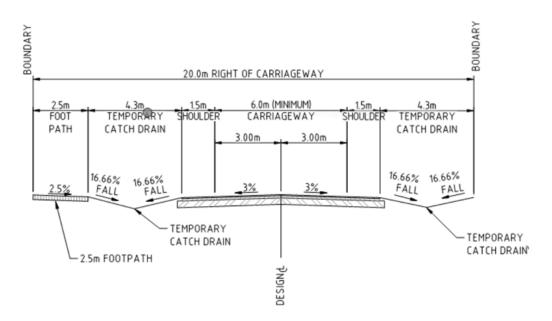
Amended Road 21 Connecting Cummins Road and the Site (via condition).
